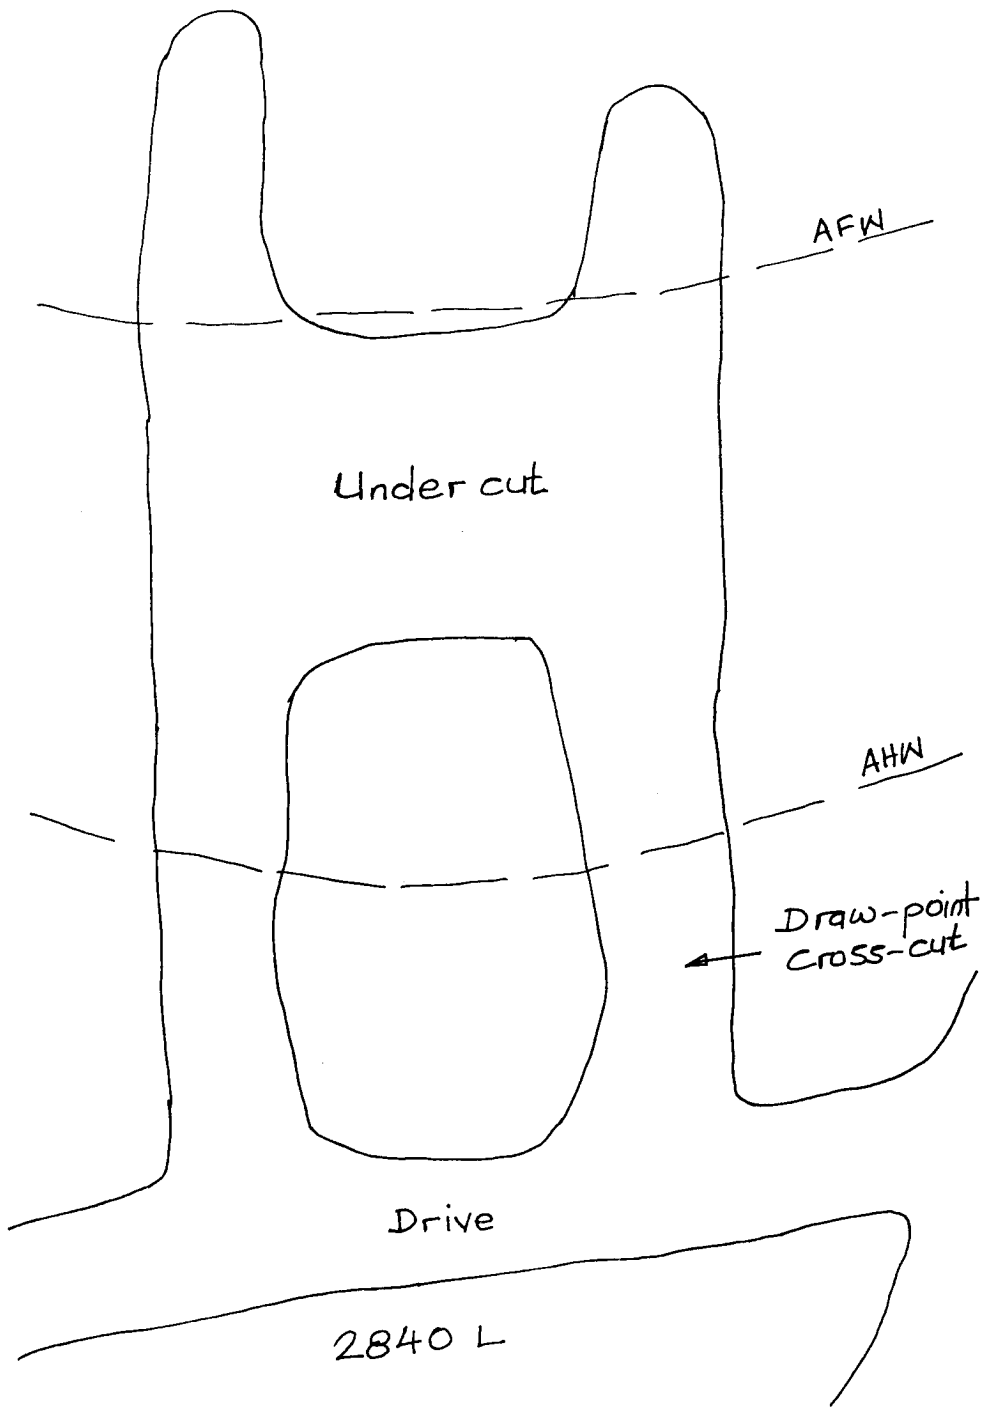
Stope under-cut and proposed raise pilot hole position at 2840ft Level
